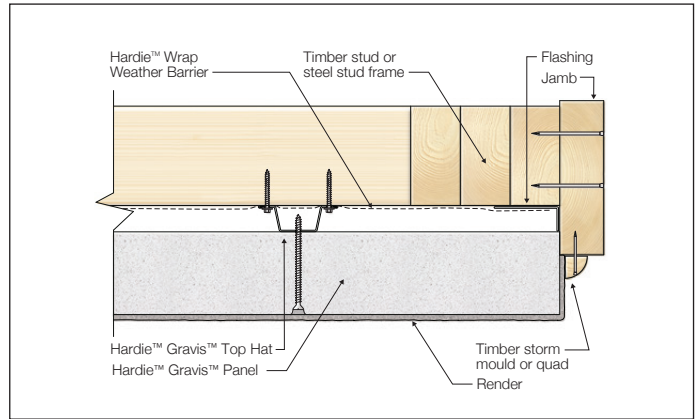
GARAGE DOOR JAMB DETAIL - OPTION 1
